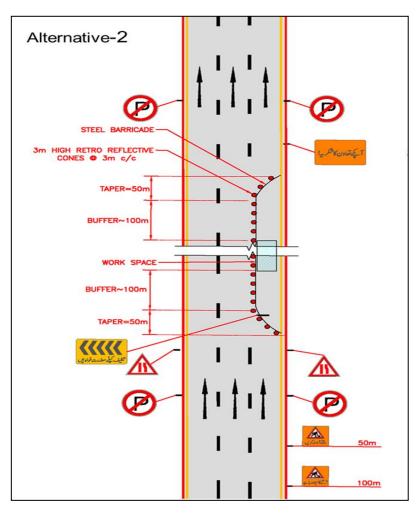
Typical Work Plans & Traffic Management Boards for Plan
